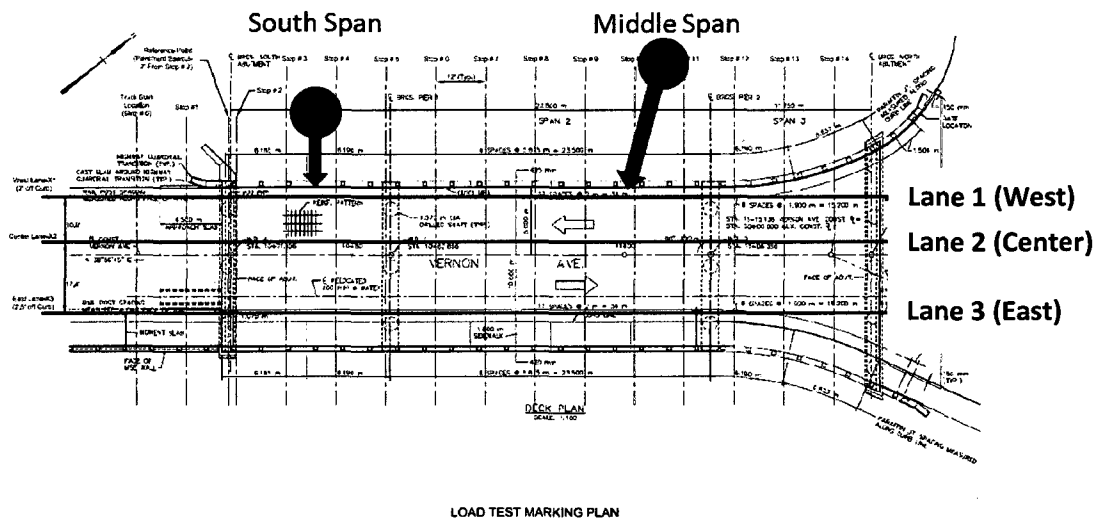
Vernon Ave plan showing truck lanes and DIC setup locations
